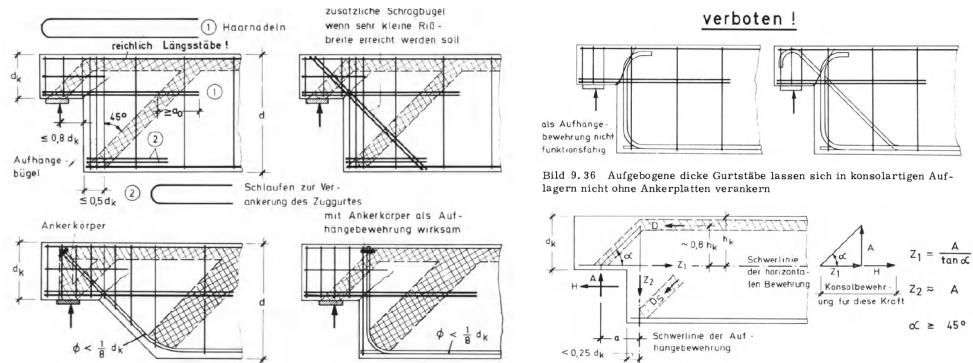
Strut-and-tie models for dapped-end beams from the Handbook of Concrete Construction [33].
